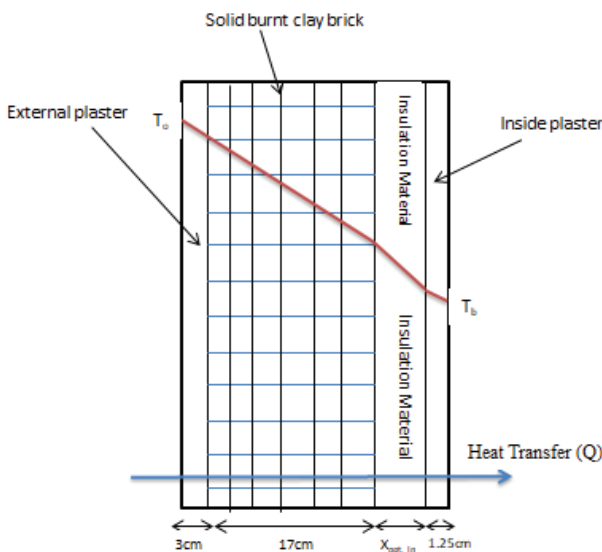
Schematic diagram of sandwich wall and insulation layer.
